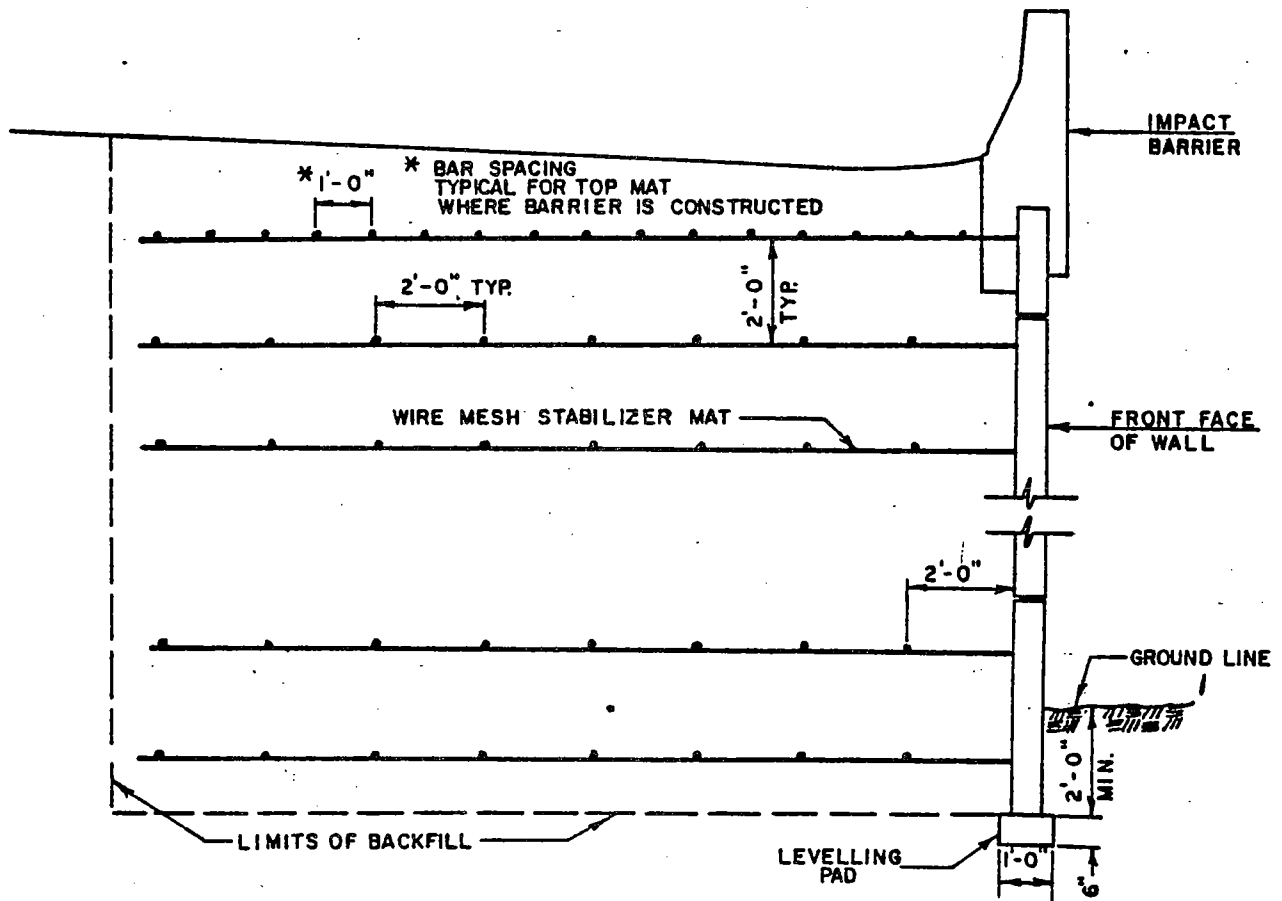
TYPICAL CROSS SECTION OF GASE
